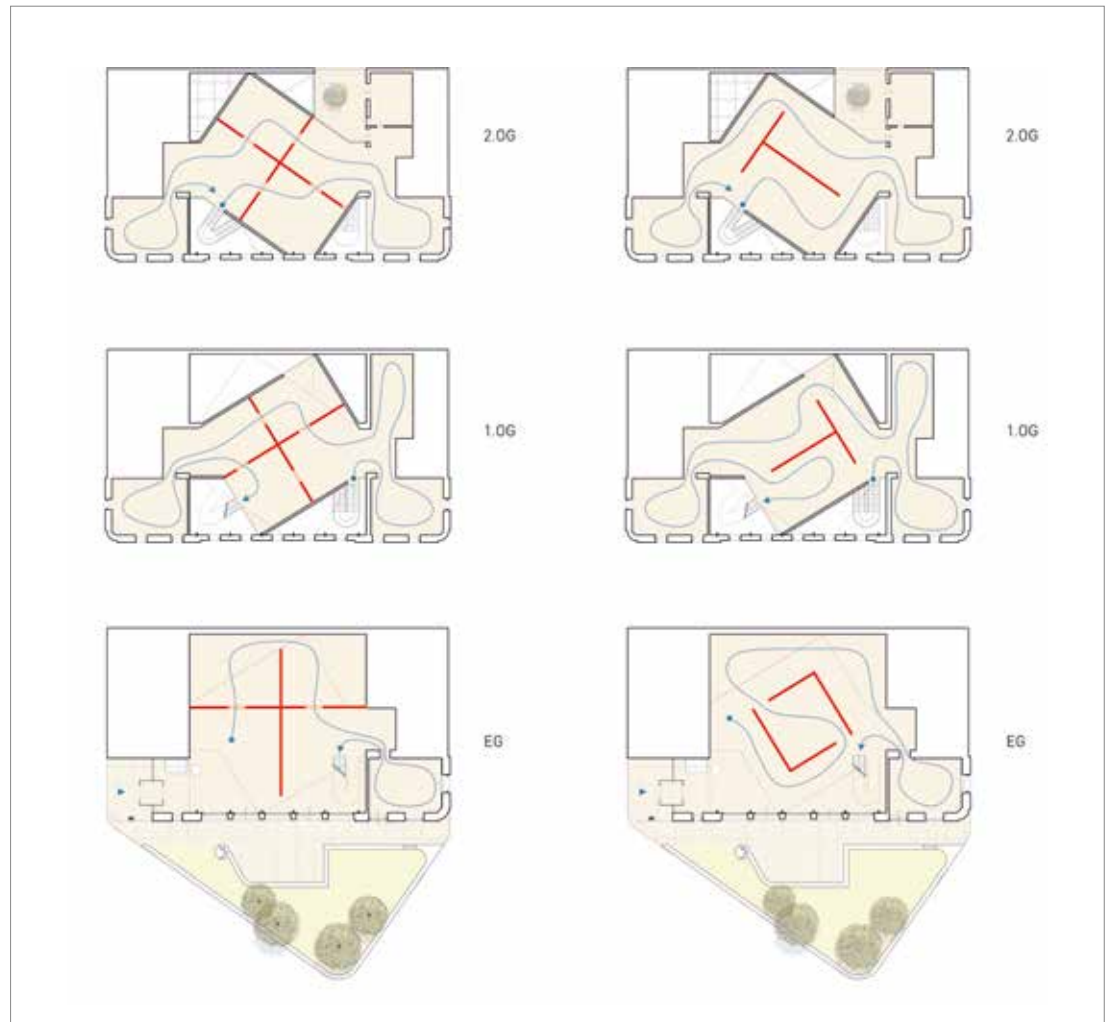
FLOOR PLANS AND POSSIBLE SPACE PLANNING
